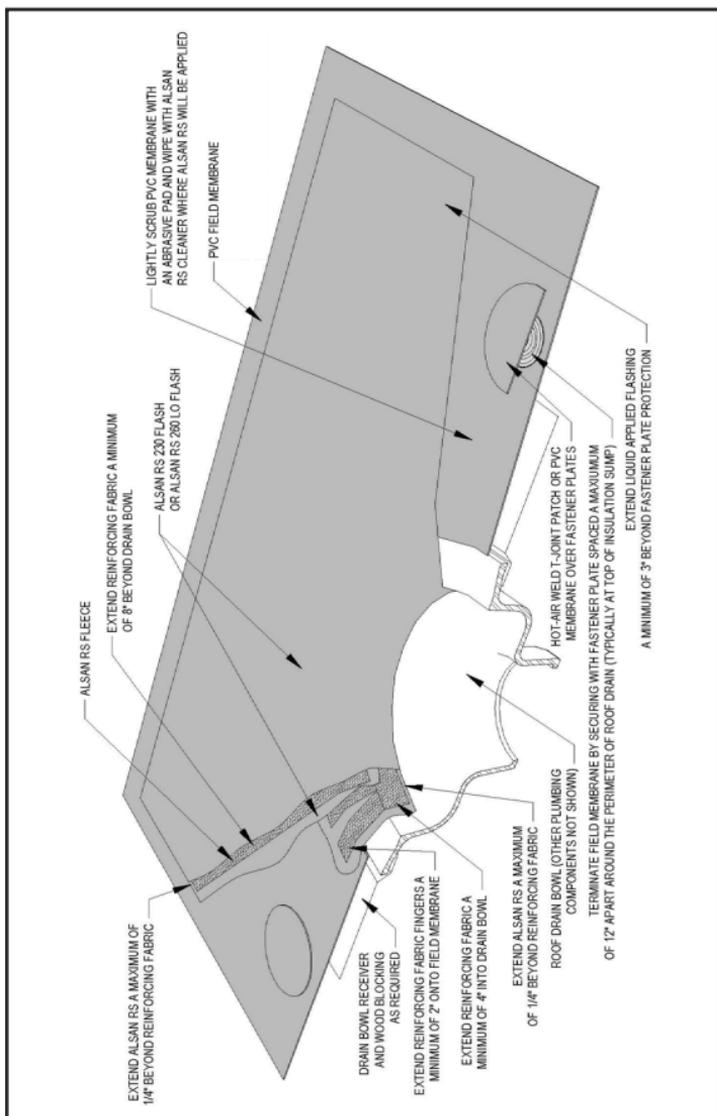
ALSAN RS Roof Drain Flashing On PVC Membrane With Horizontal Perimeter Fastening
